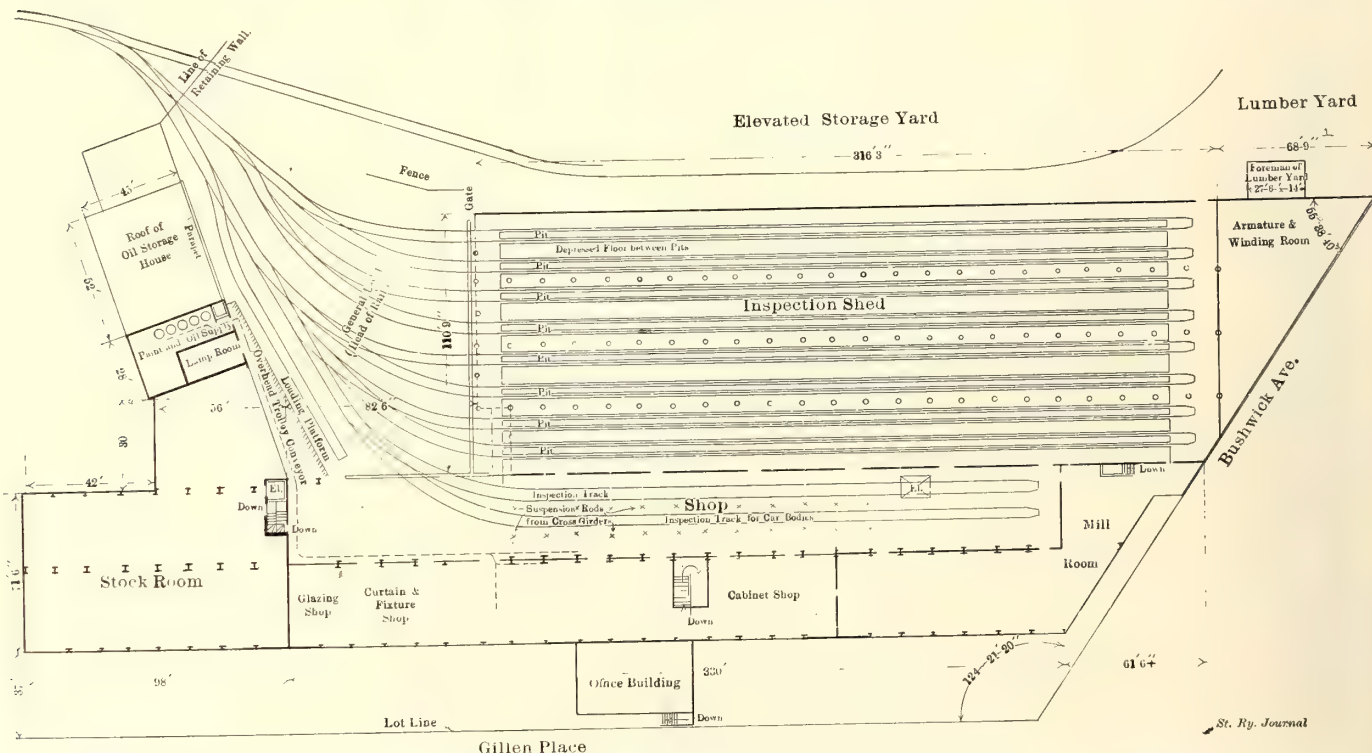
SECOND-FLOOR PLAN OF THE EAST NEW YORK SHOP AND STORAGE BUILDINGS, AND OF THE ELEVATED RAILWAY TRACKS
